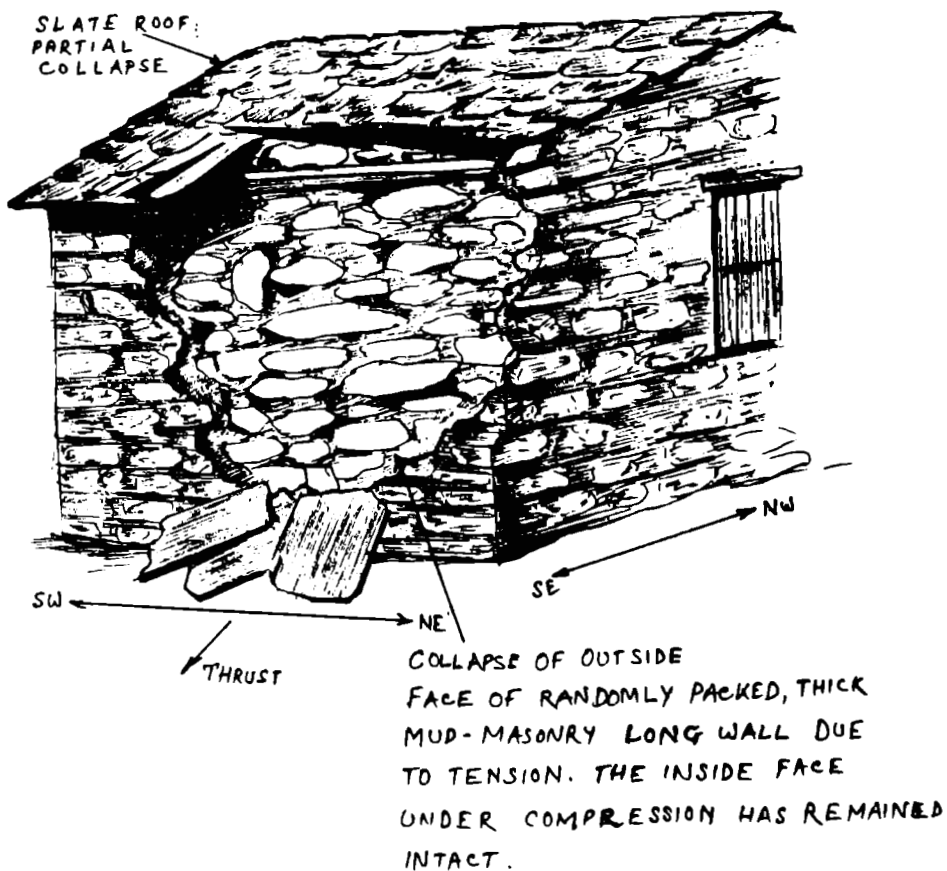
PARTIAL COLLAPSE OF MUD MASONRY WALL UNDER TENSION, GAURI GRAM, DUGADDA (SKETCH BY P. PANDE)
